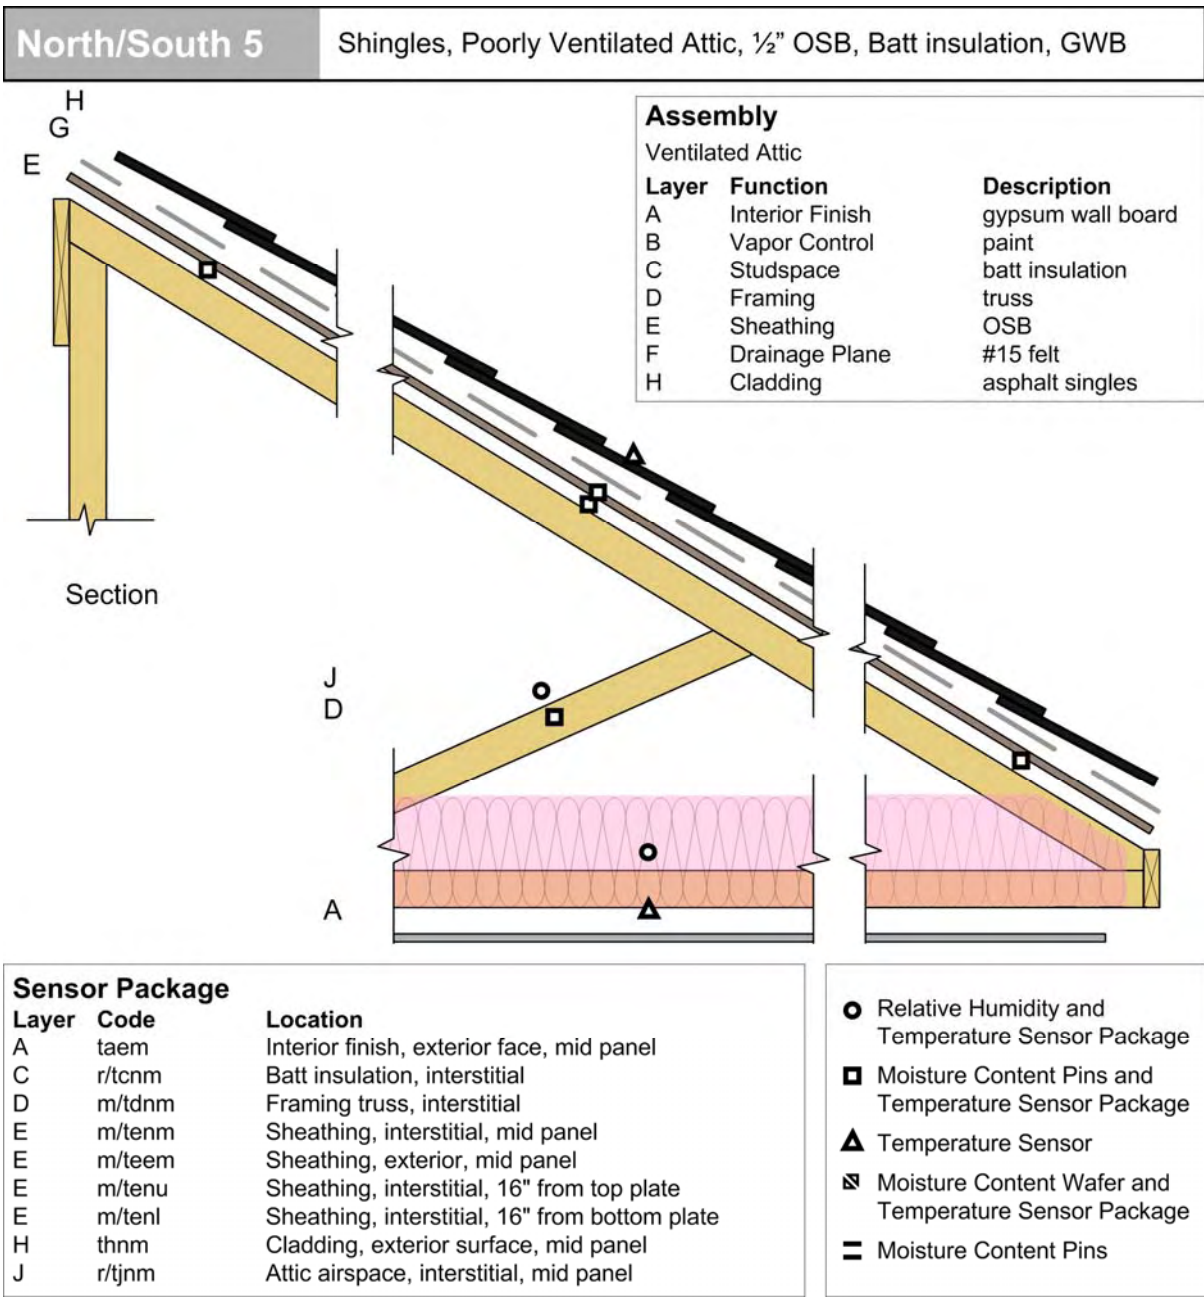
Atlanta Roof 5: Conventional Ventilated Attic, construction and sensor layout
